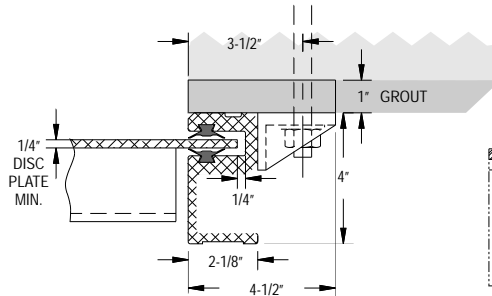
761- Aluminum Flat Frame Mounting; Section AA
